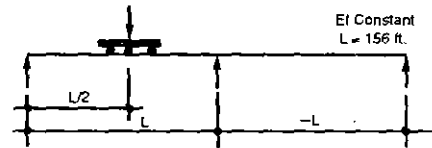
Two-span continuous bridge of four-cell box-section
